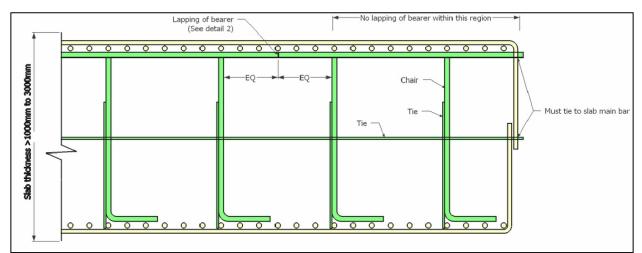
Typical details for support for rebar mats in heavy slabs and transfer plate (2 of 3)
